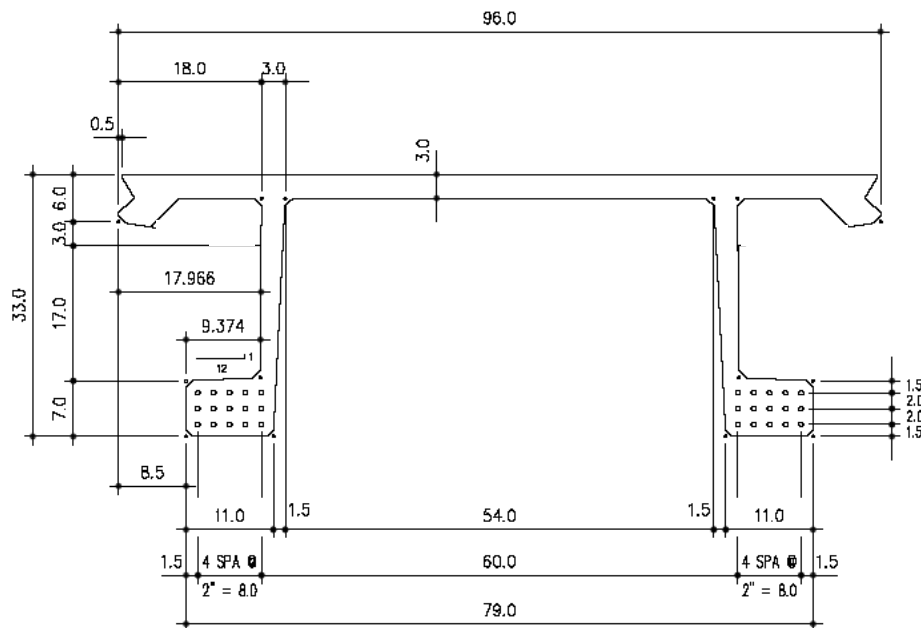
Cross-section of MIT/FHWA Pi-girder (imperial units – inches)
